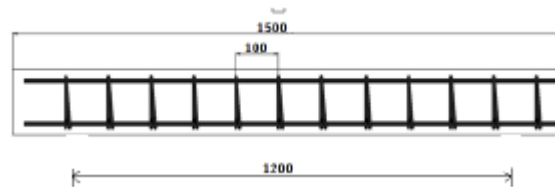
Simply supported beam detailing by Sunil Raiyani and Sonal Thakkar
